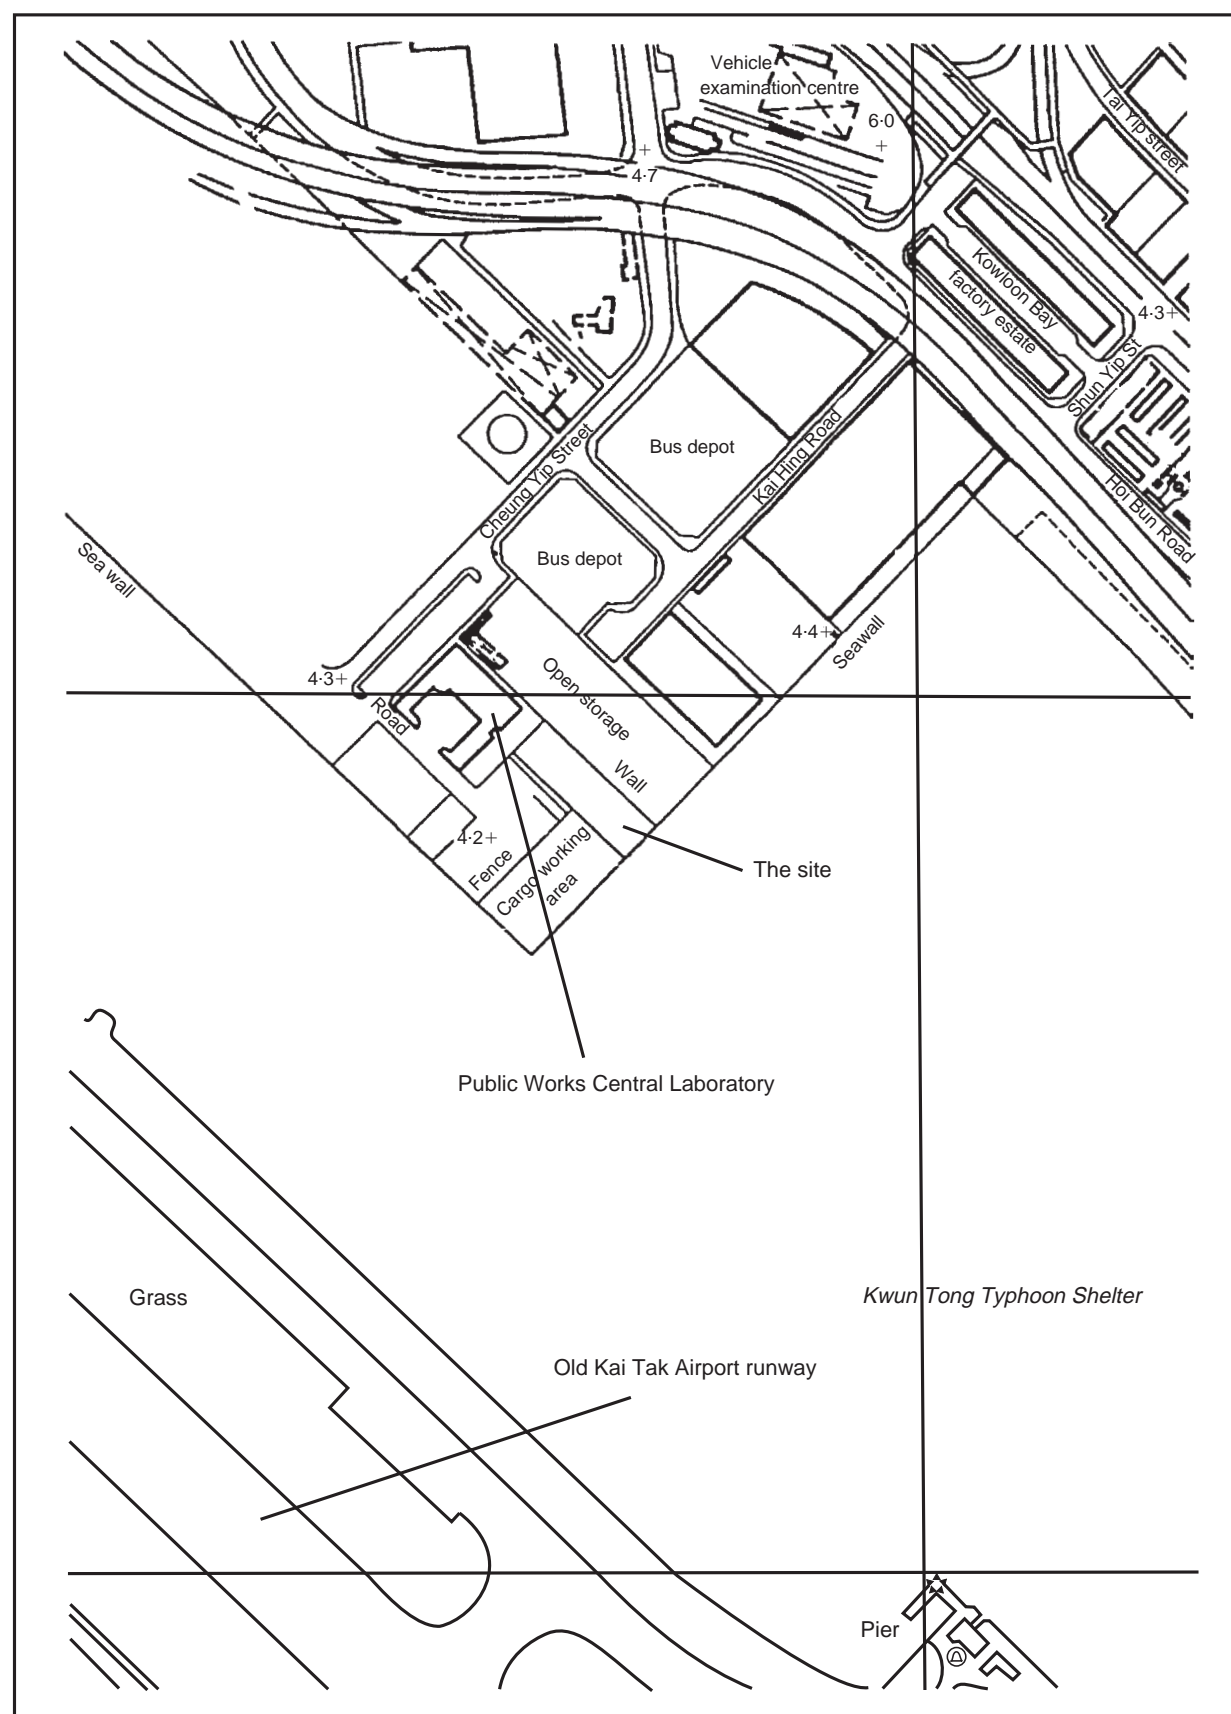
Location plan of test pile site in Kowloon, Hong Kong
